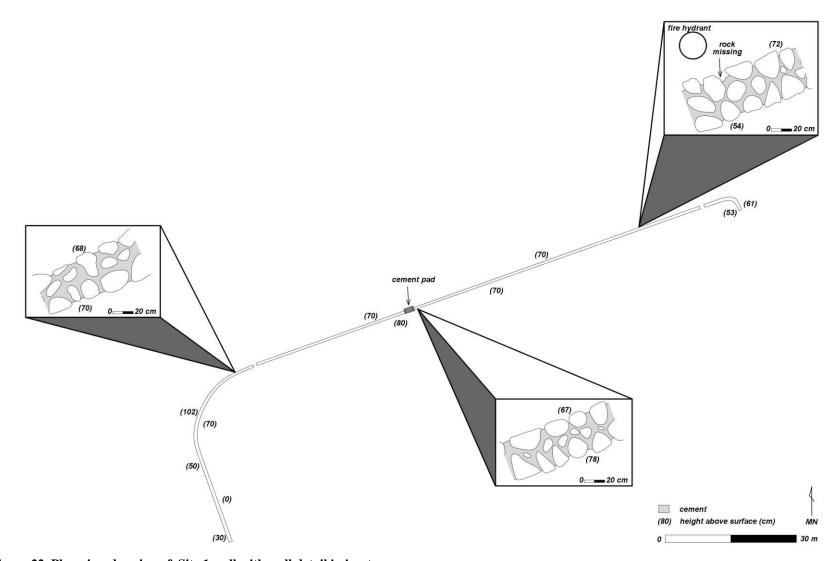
Plan view drawing of Site 1 wall with wall detail in insets.
